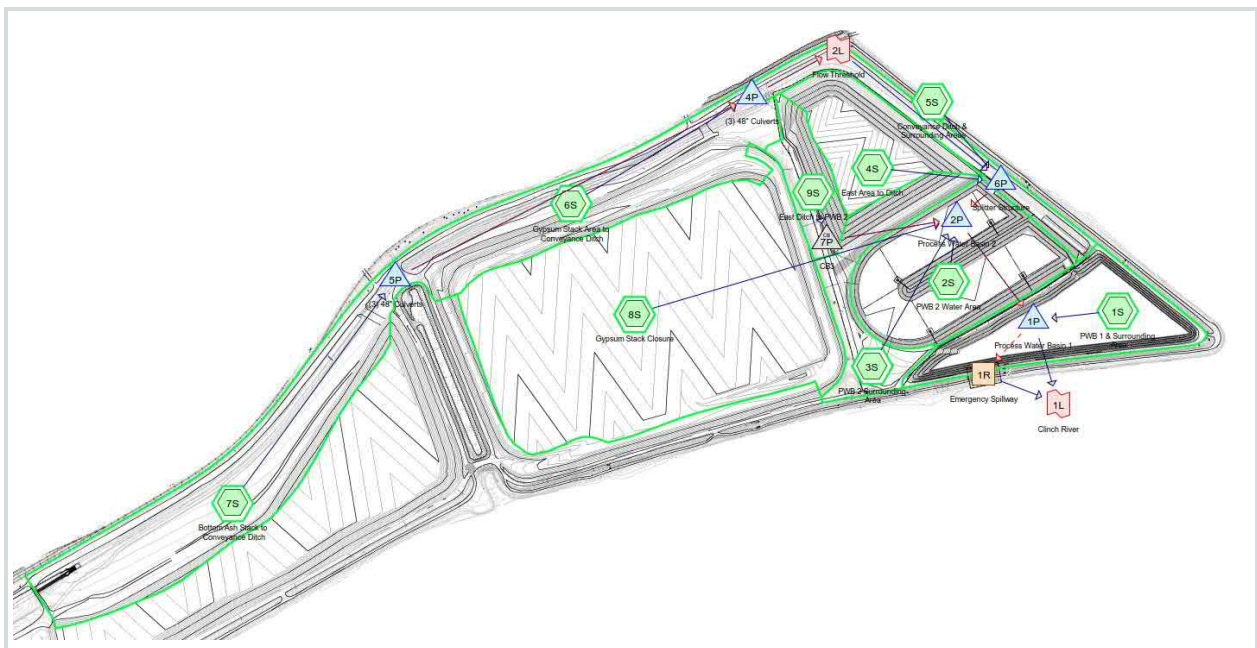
Proposed Conditions Hydraulic Routing Diagram
